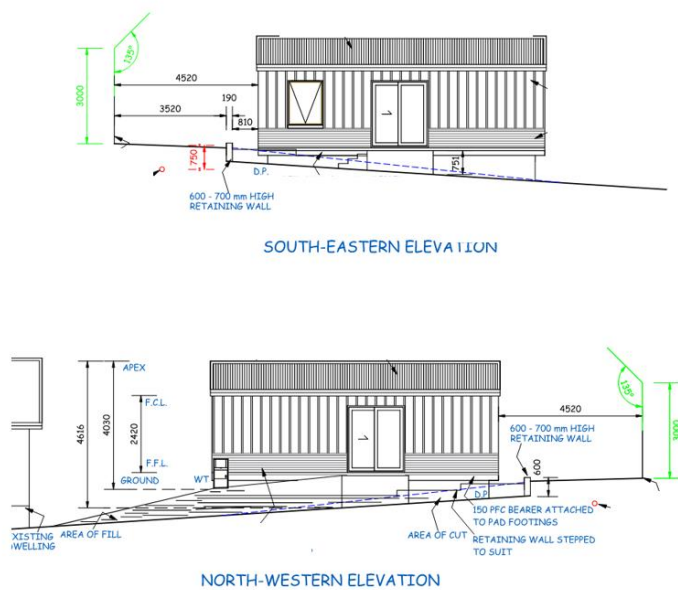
Elevation plans showing the south-eastern and north-western elevation of the proposed development.
